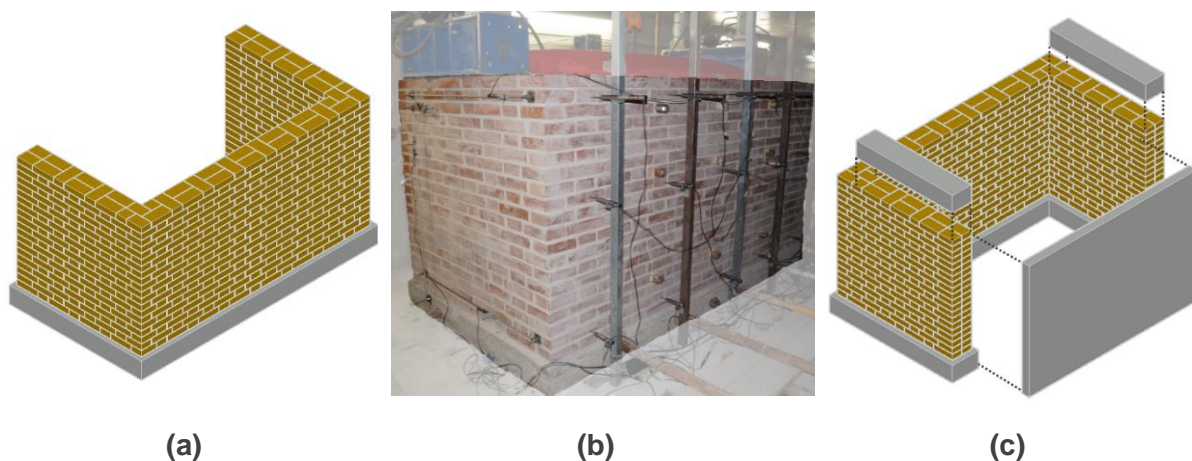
U-shaped specimen: (a) axonometric view; (b) final construction stage; and (c) applied vertical load in transversal walls with the frame to support the airbag.
